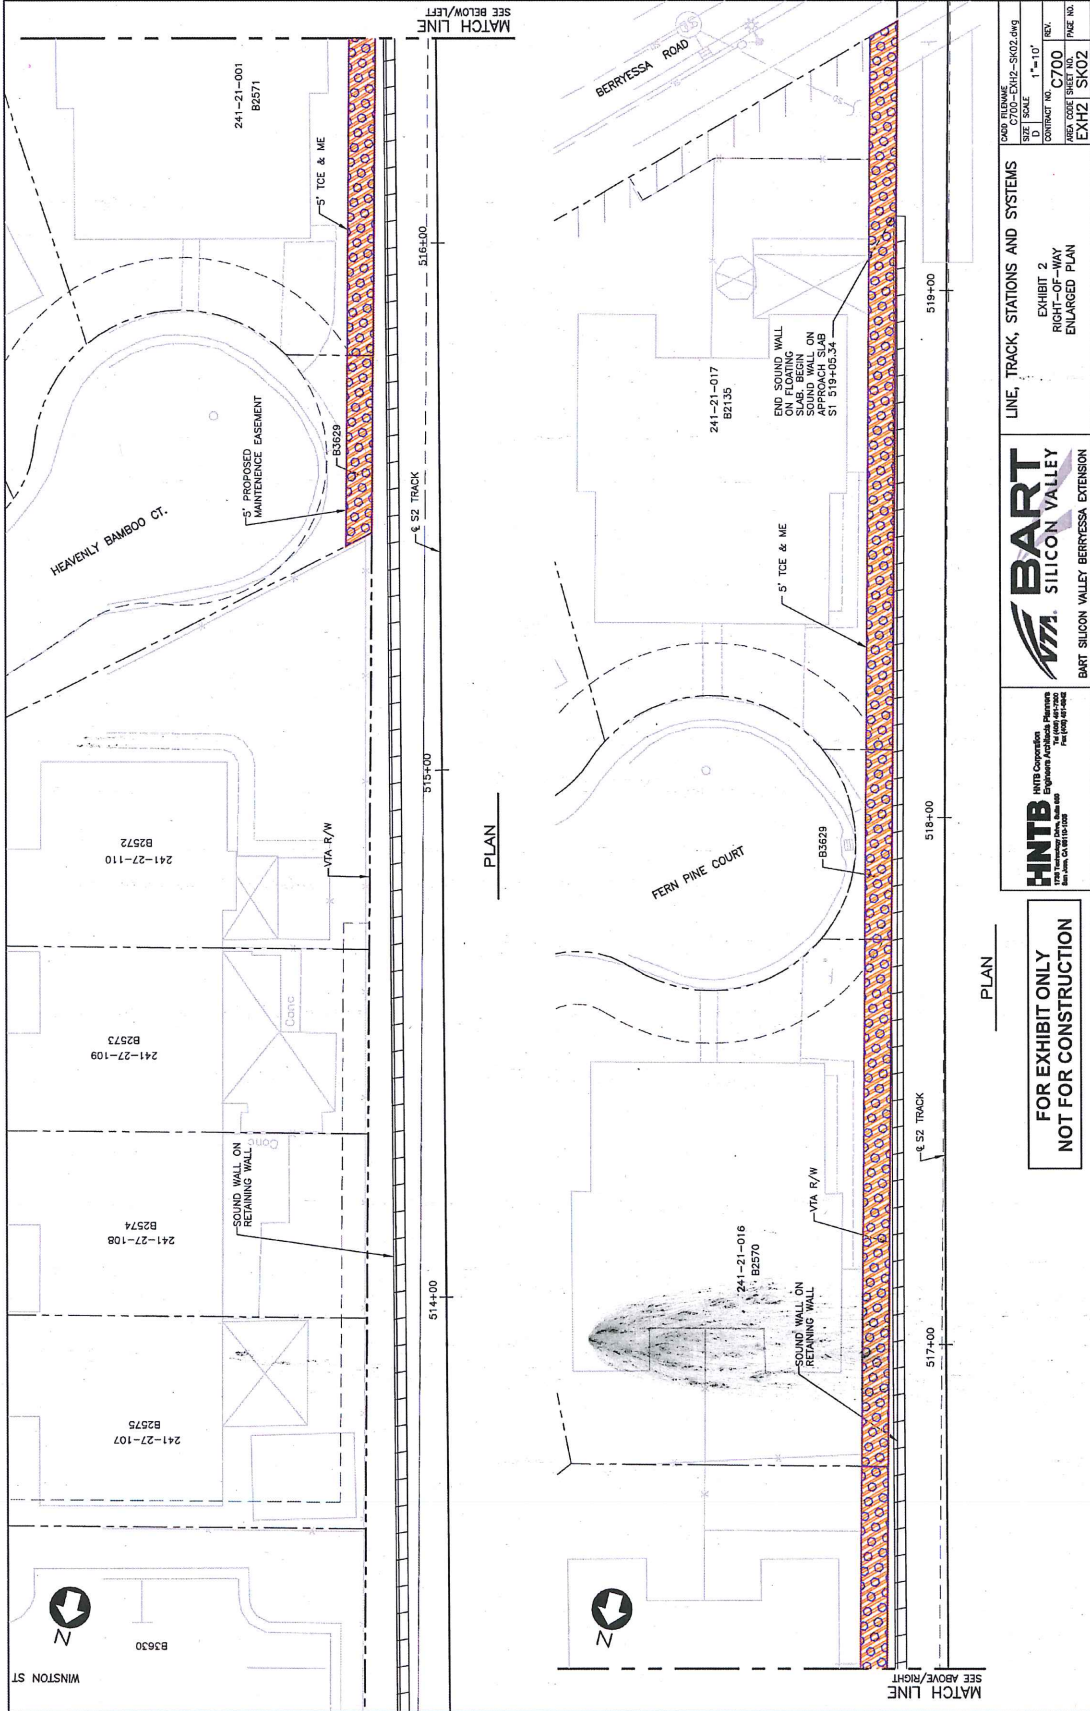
New Easements Needed East of the Elevated Structure and North of Berryessa Road
